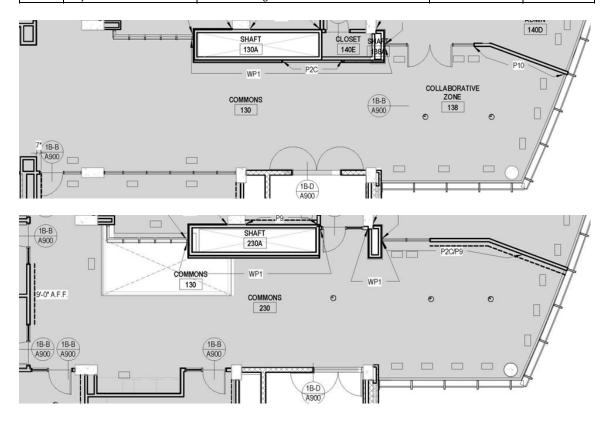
| 1st and 2nd Floor Commons Finish Plans
